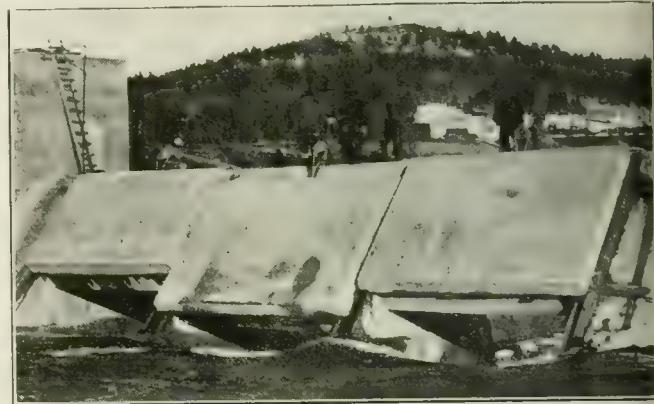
REINFORCED-CONCRETE SLABS FOR CLOSING DAM
